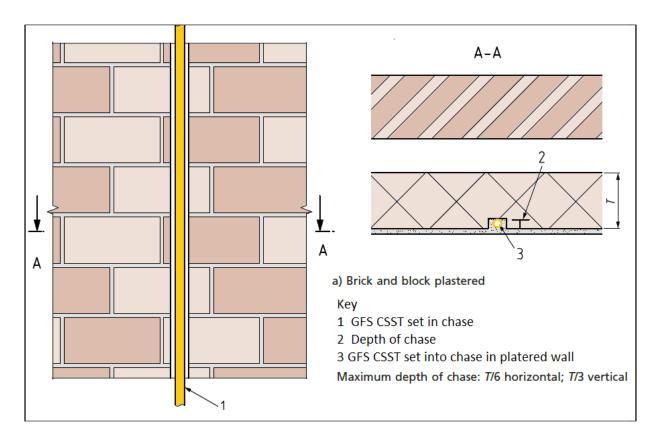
Typical Example of Pipework installed brick and block plastered wall
